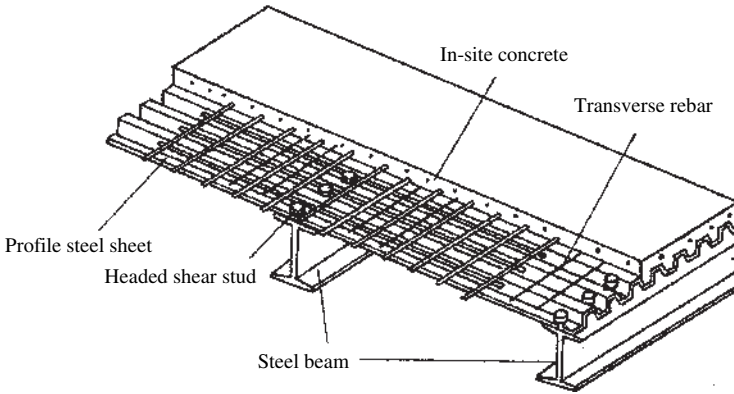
Floor system in multi-storey, high-rise steel buildings
